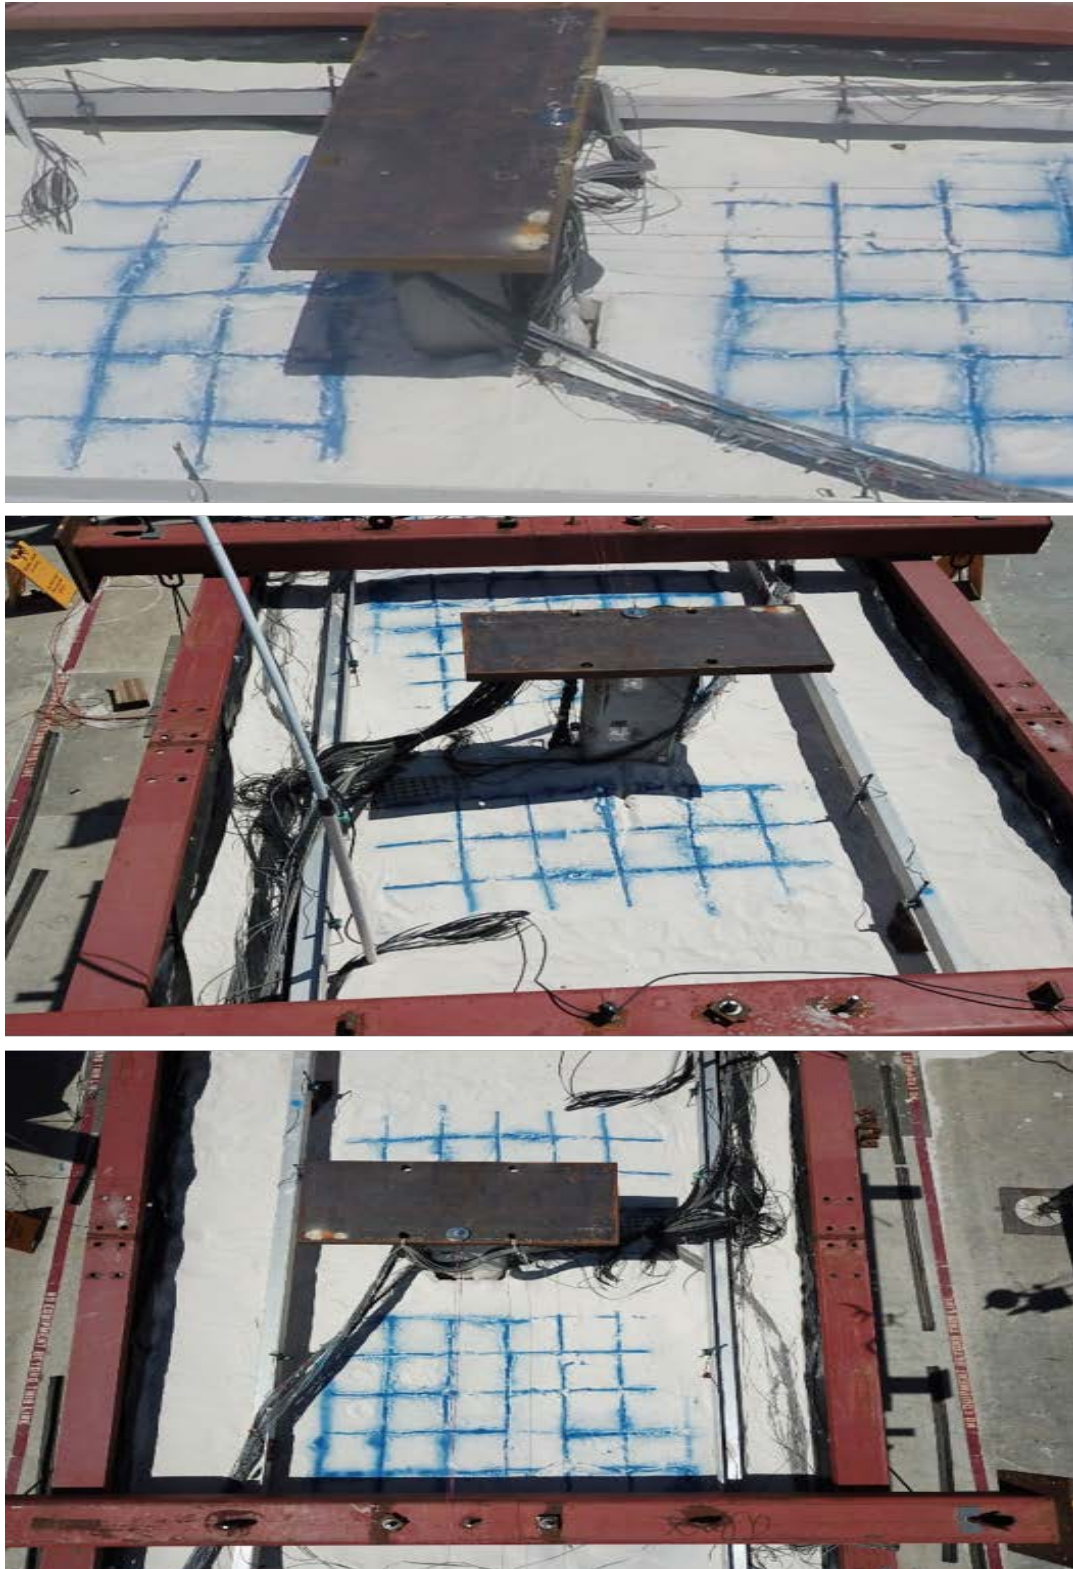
Soil surface view after shaking (showing upslope heave and downslope gap)
